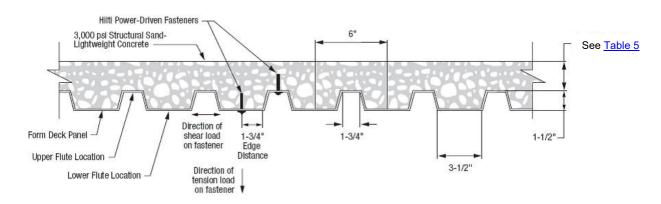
HILTI FASTENER LOCATIONS IN 11/2-INCH-DEEP COMPOSITE FLOOR DECK PANEL
